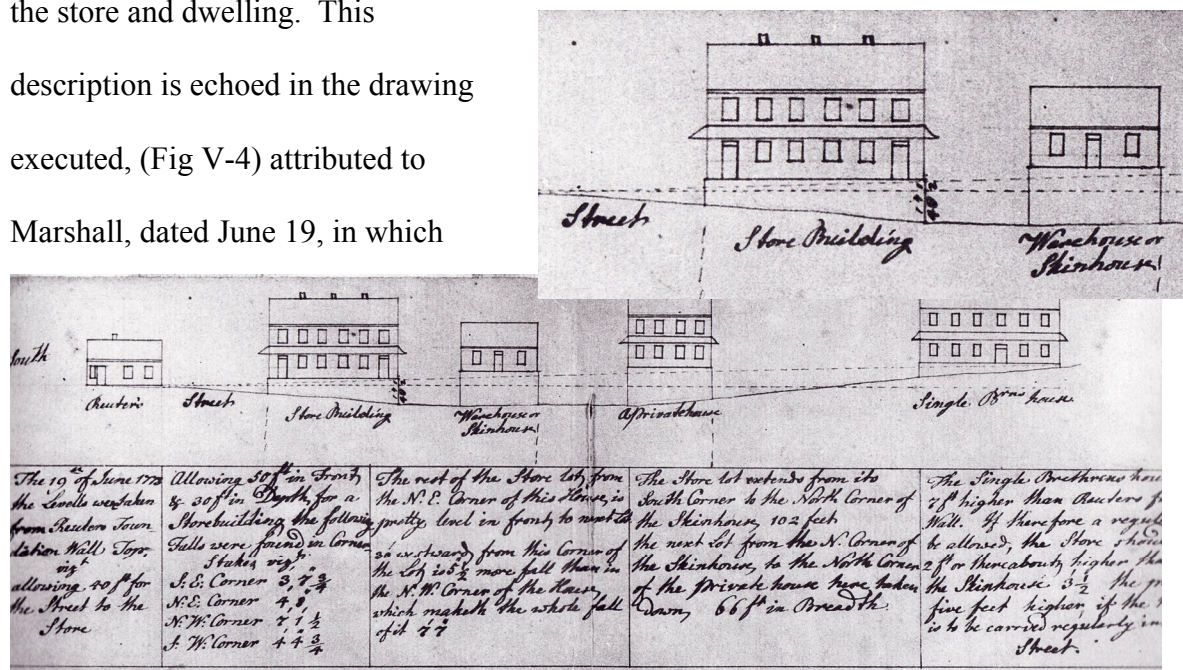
Elevation of Main Street facing West. Jun 19, 1773. Frederic William Marshall. Old Salem Museums & Gardens. Original in Moravian Archives-Southern Province, Winston-Salem, NC. [Detail of sketch for the Store building.]
